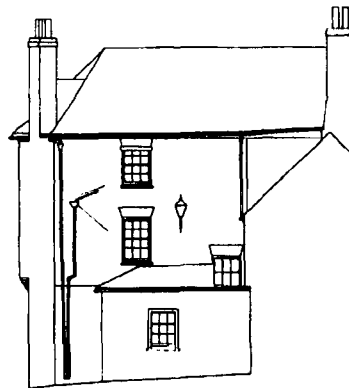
Old Brewery Yard North Elevation Source: Hotel Architect
